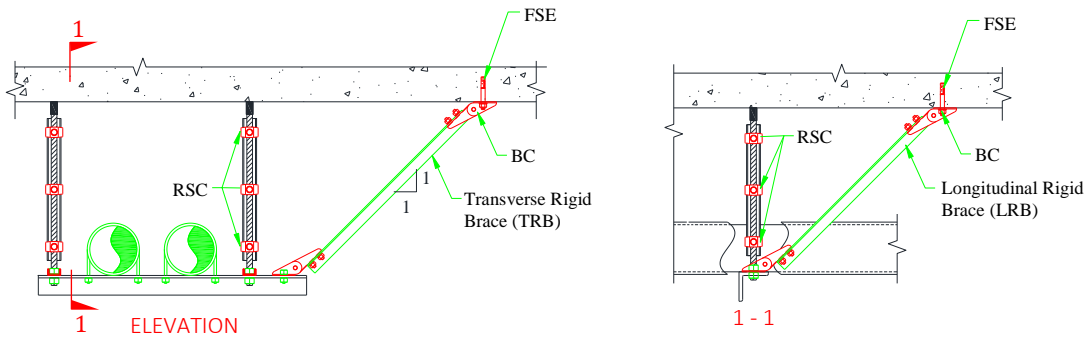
Seismic Rigid Bracing for Trapeze supported pipes
